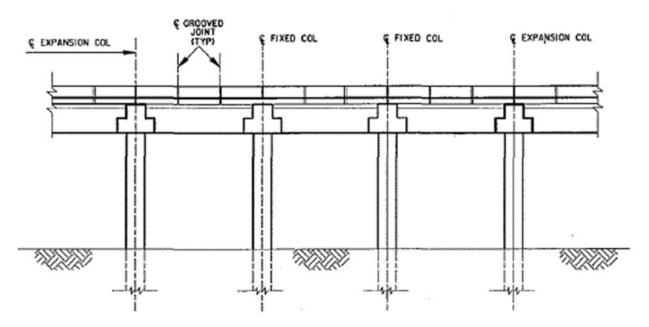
Typical Tee Beam Unit Elevation – 3 Continuous Spans
